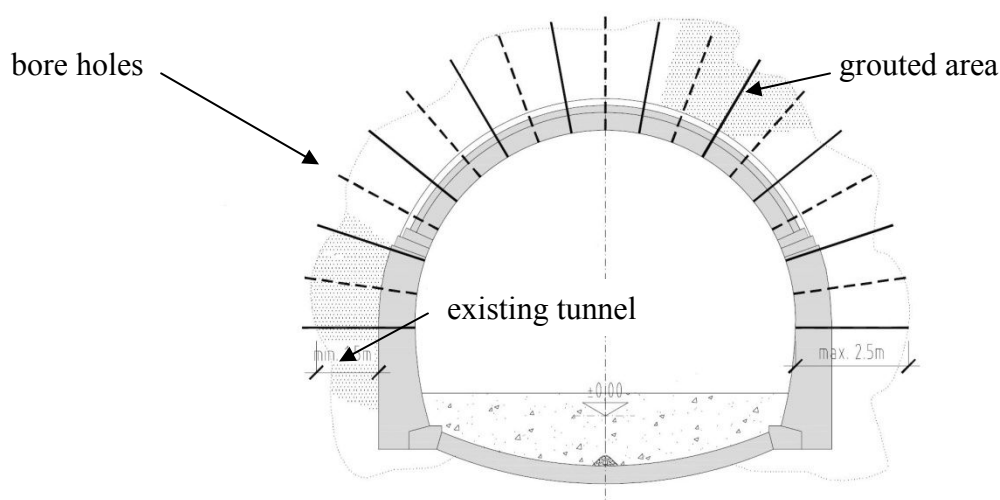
, Stabilizing of packing by dint of grouting (source Beton- und Monierbau)
